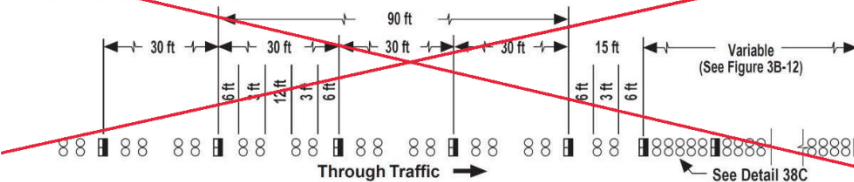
B - Lane Drop Markings at Conventional Highway Intersections
